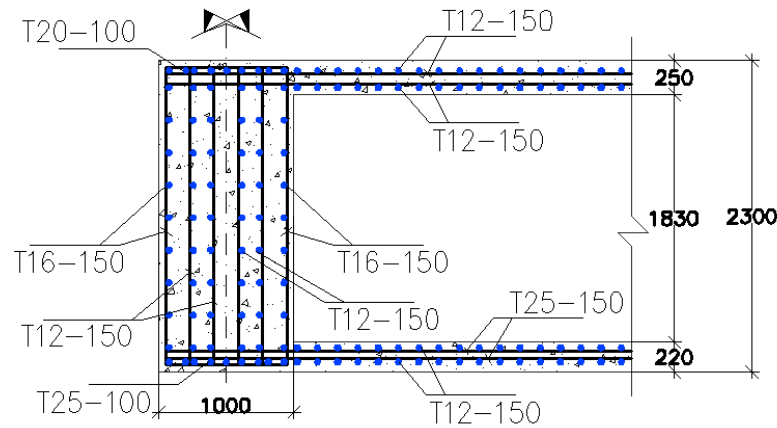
RC Bridge. Reinforcement details of the diaphragms at the left and right supports.
